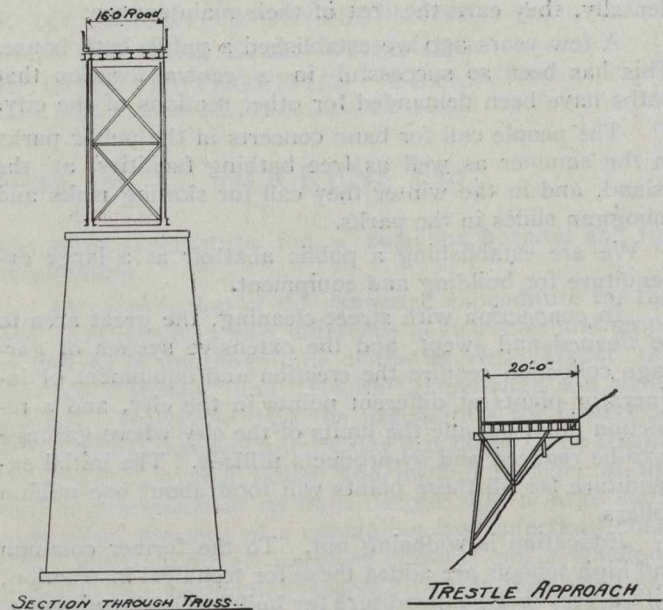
Sections at Abutment and Trestle, Lytton, B.C.
